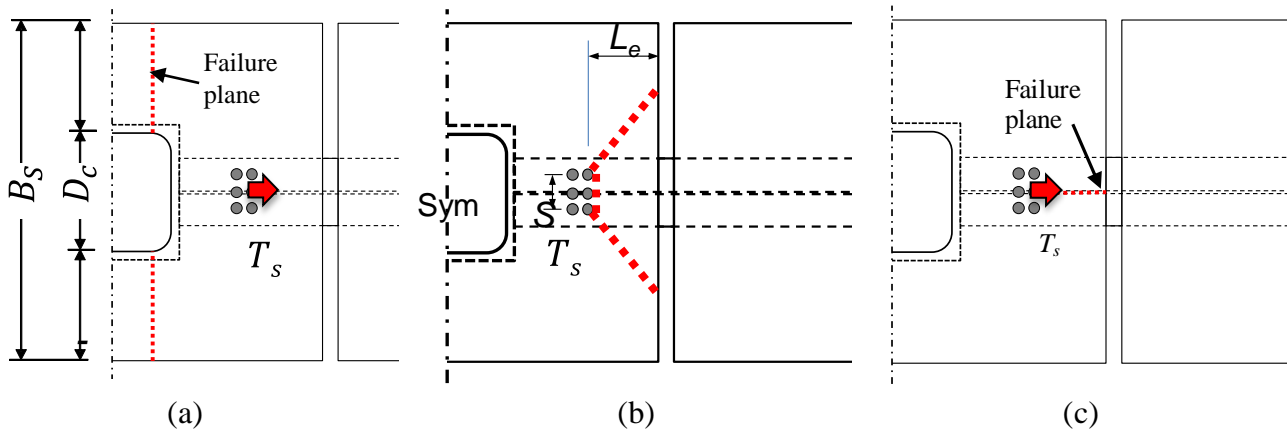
Failure modes of slab: (a) Tensile failure; (b) Breakout failure; (c) Split failure
